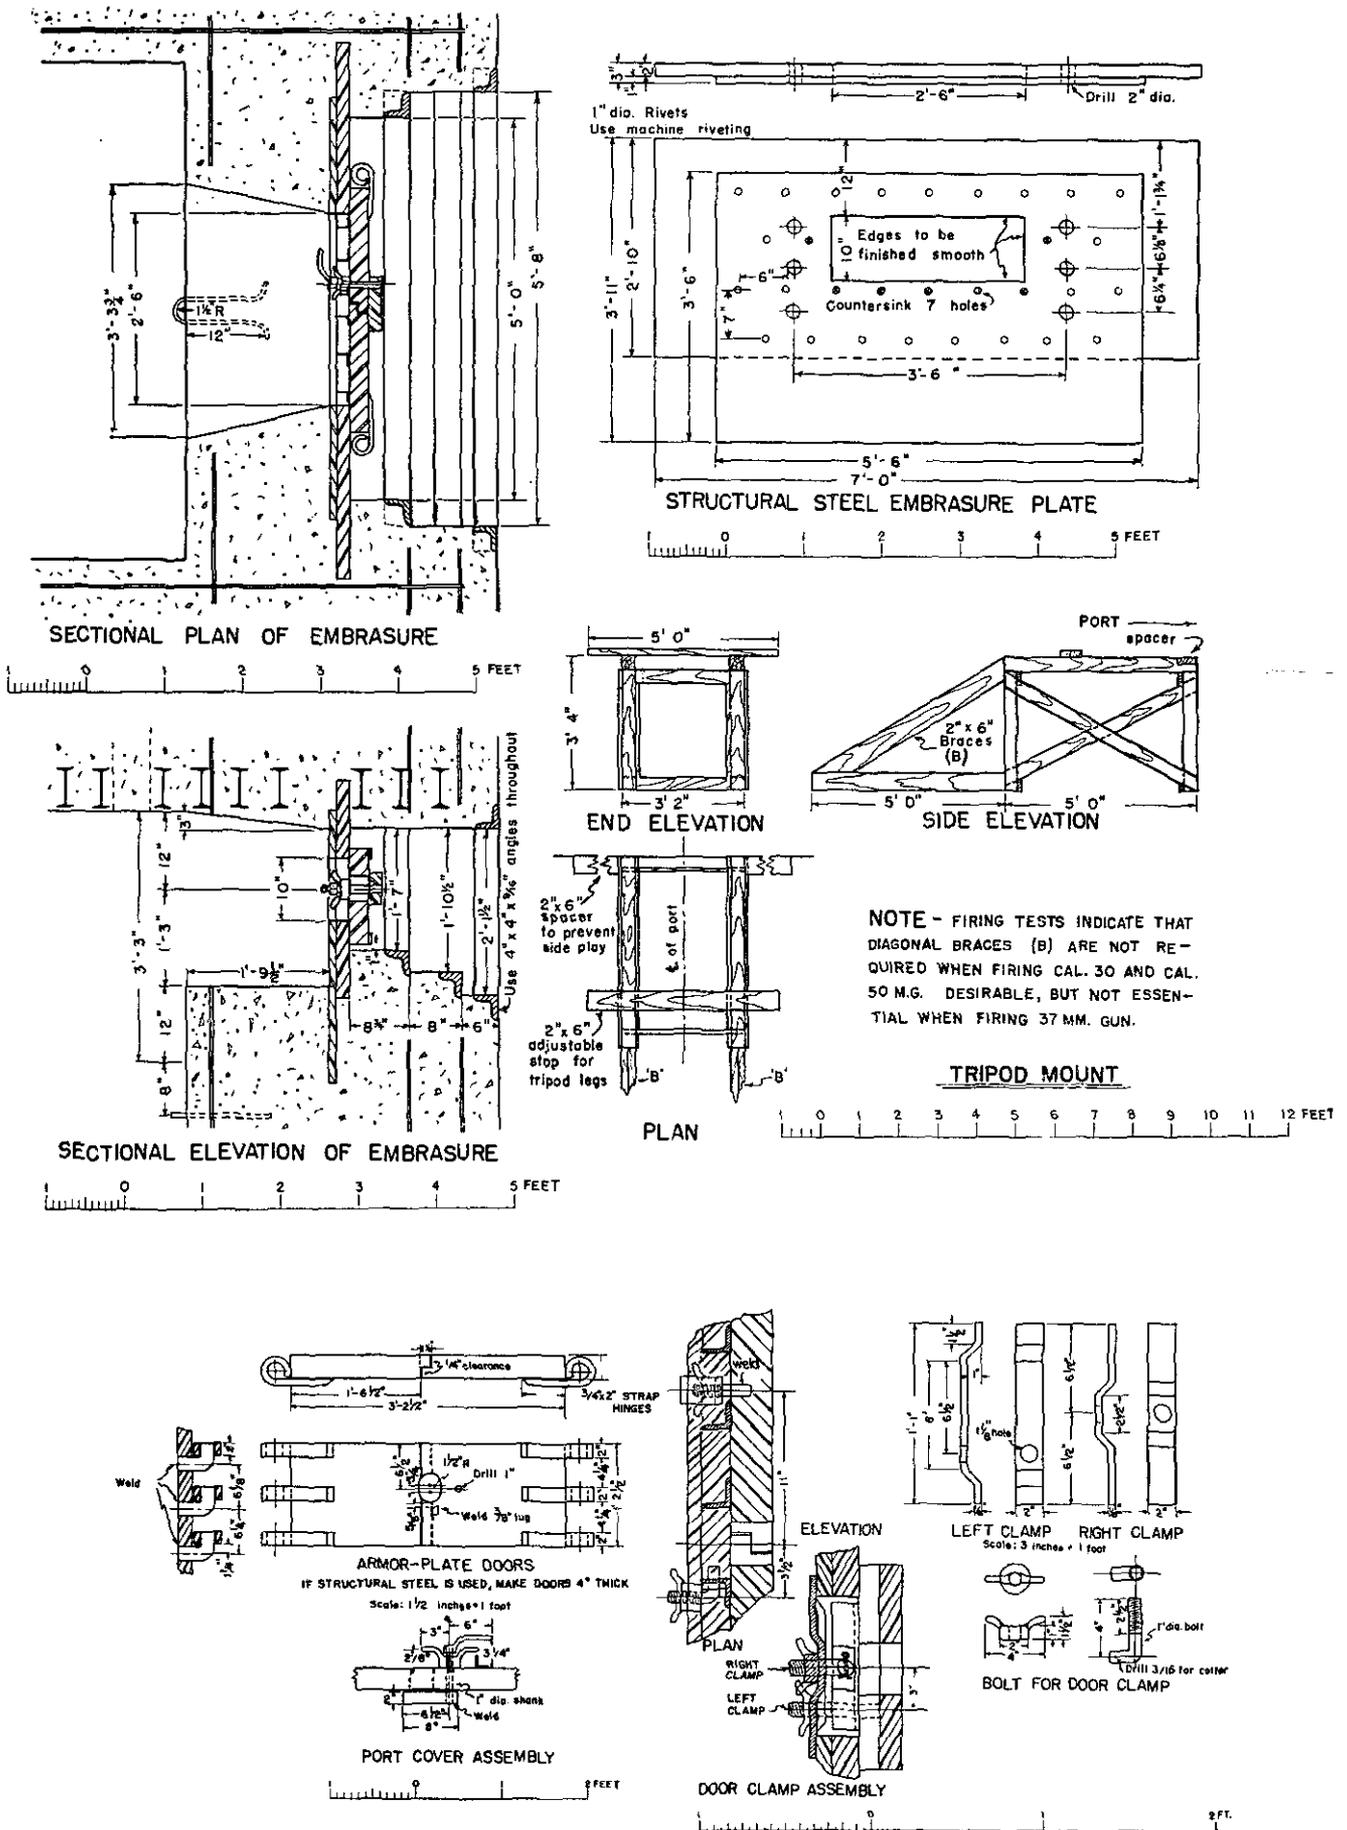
Section and details of embrasure and tripod mount, light shellproof machine-gun emplacement.
